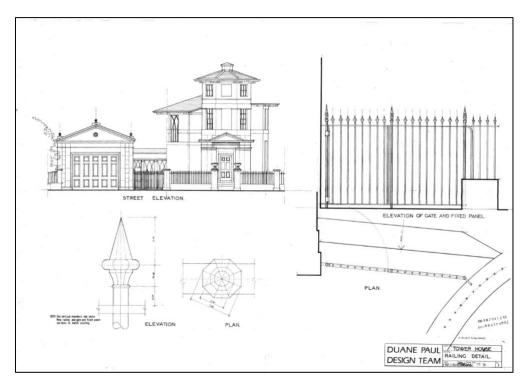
Proposed new railing and entrance gates as per drawing 75.76 by Duane Paul Design Team, 1989
